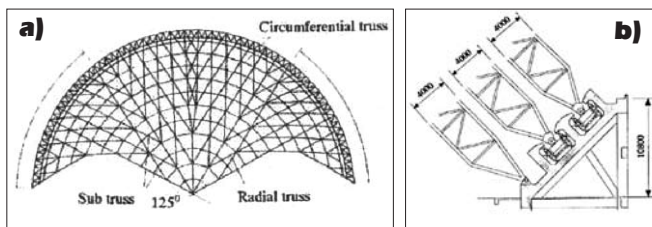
Fukuoka stadium a.) geometry of a roof panel b.) roadbed section (Ishii, 2000)
